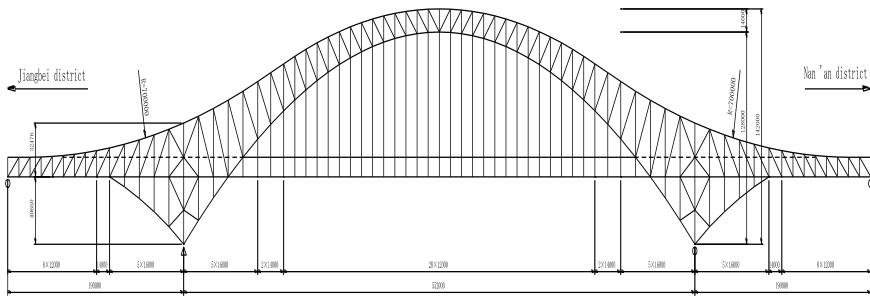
Schematic diagram of Chaotianmen Yangtze River Bridge Elevation Layout(units:mm)
